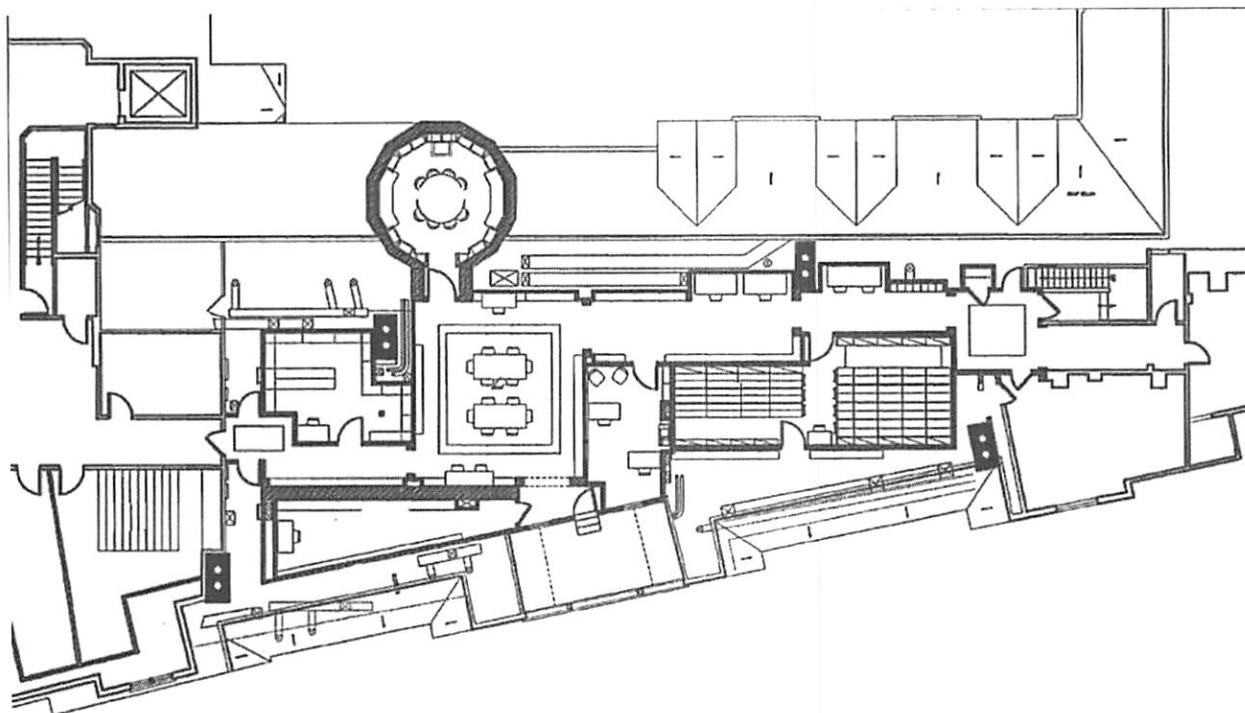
Partial third floor plan of Information Resource Center (Durkee, Brown, Viveiros & Werenfels Architects)
